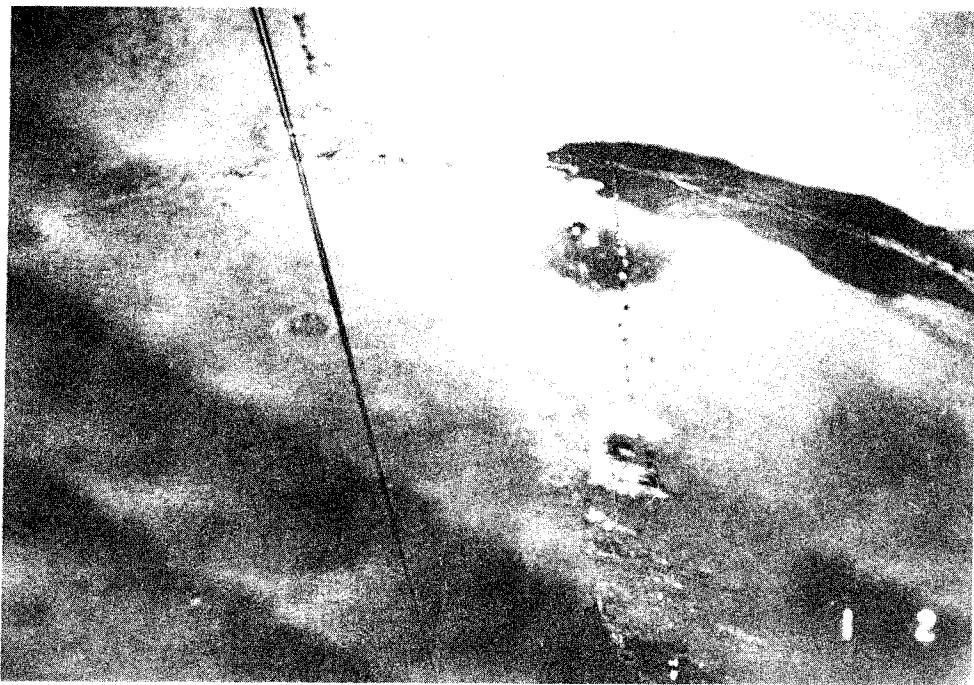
Monolith joint 4/5 before grouting, Blakely Mountain Dam, 1986
